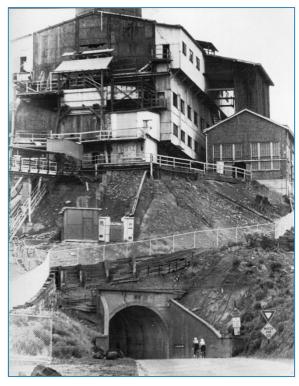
Ruston Tunnel under the former Asarco plant. Photo courtesy of Sherri Forch
